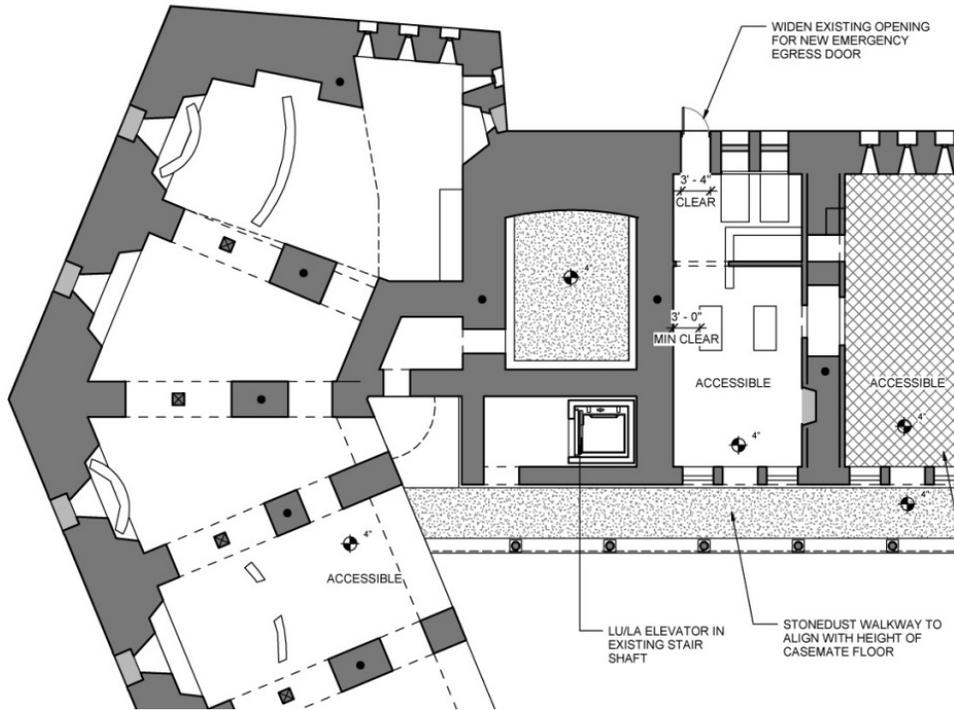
Accessibility Option A. Remove west metal stair for LU/LA elevator to 2nd tier.
